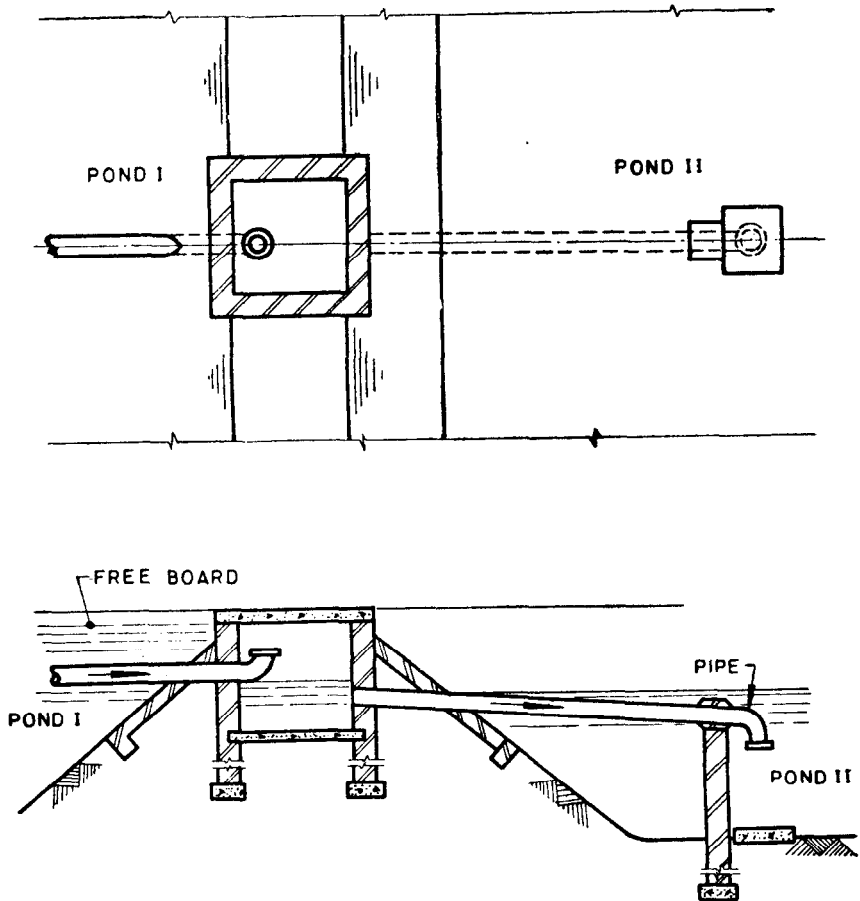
TYPICAL DETAILS OF OUTLET SYSTEM WITH PIPE OUTLET FOR DRAINAGE OF SMALL PONDS
